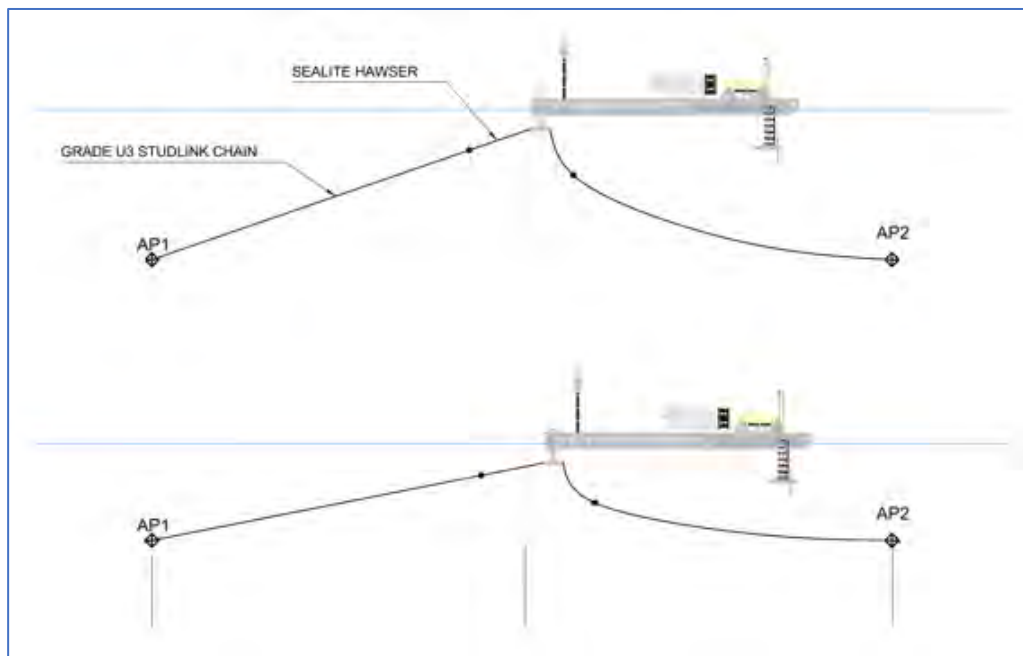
PLAT-I Anchor and Mooring System Arrangement
